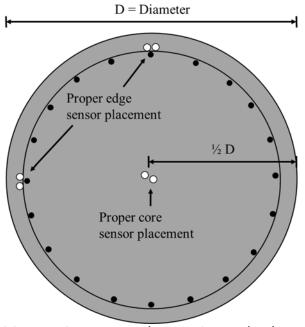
Correct temperature sensor placement on a circular column cross section (example of a horizontally oriented cross section)
